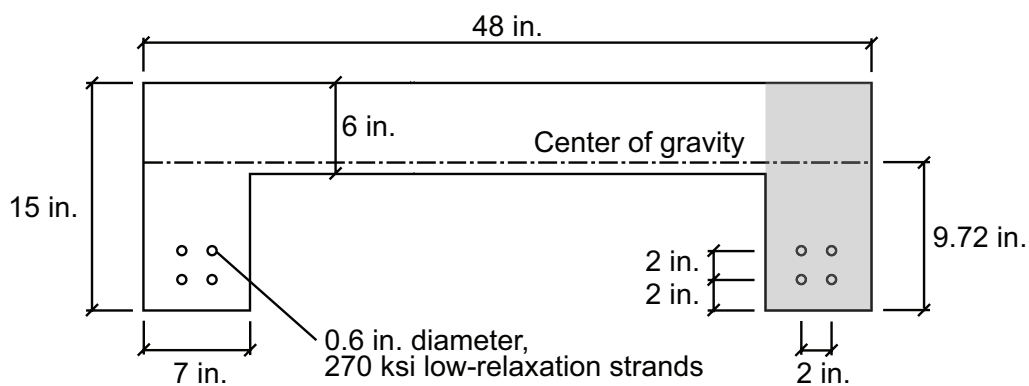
Preliminary full-scale ultra-high-performance concrete replacement prestressed girder. Note: 1 in. = 25.4 mm; 1 ksi = 6.895 MPa.
